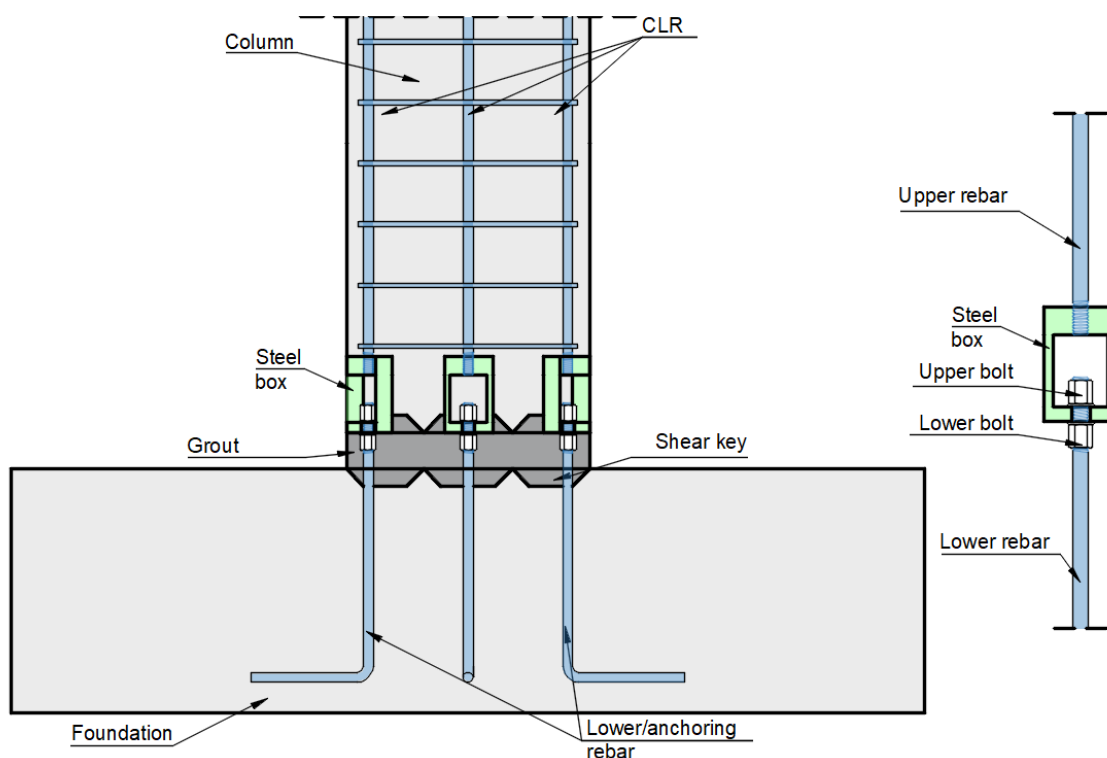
The CF connection with the steel box adapted from Quing et al. [67]
